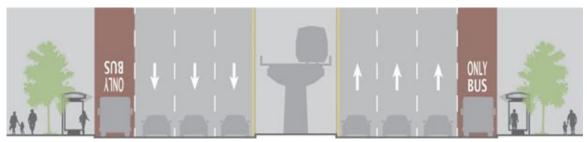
| Alternative 1 cross-section of Tyco Road from Route 7 to Spring Hill Road
